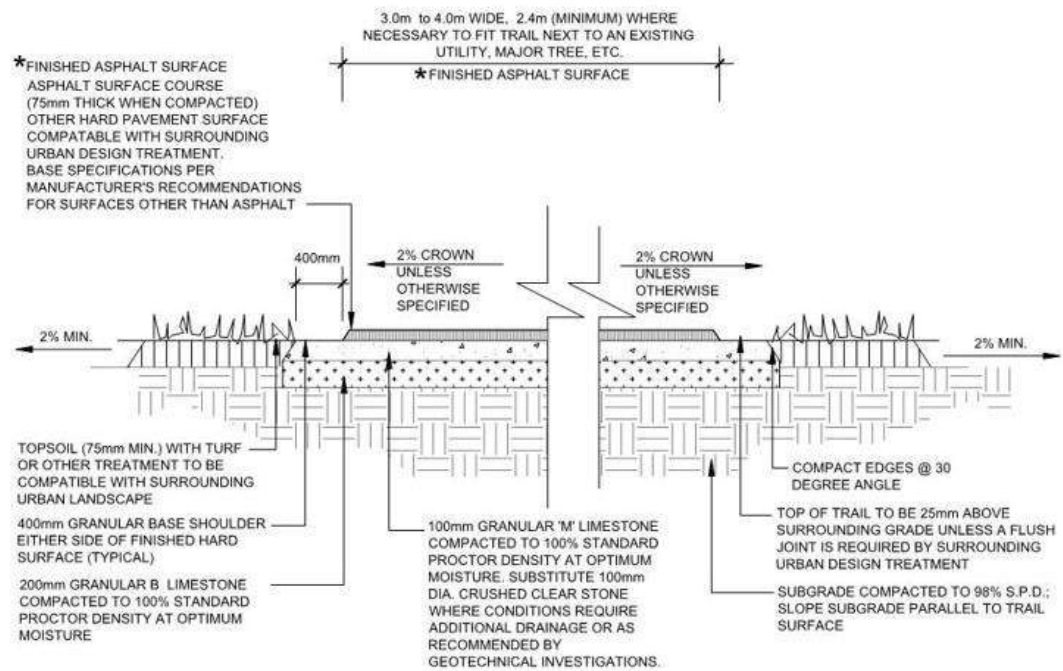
Design Considerations for Hard Suraced Multi-use Trails outside of Active Road Rights-of-Way
